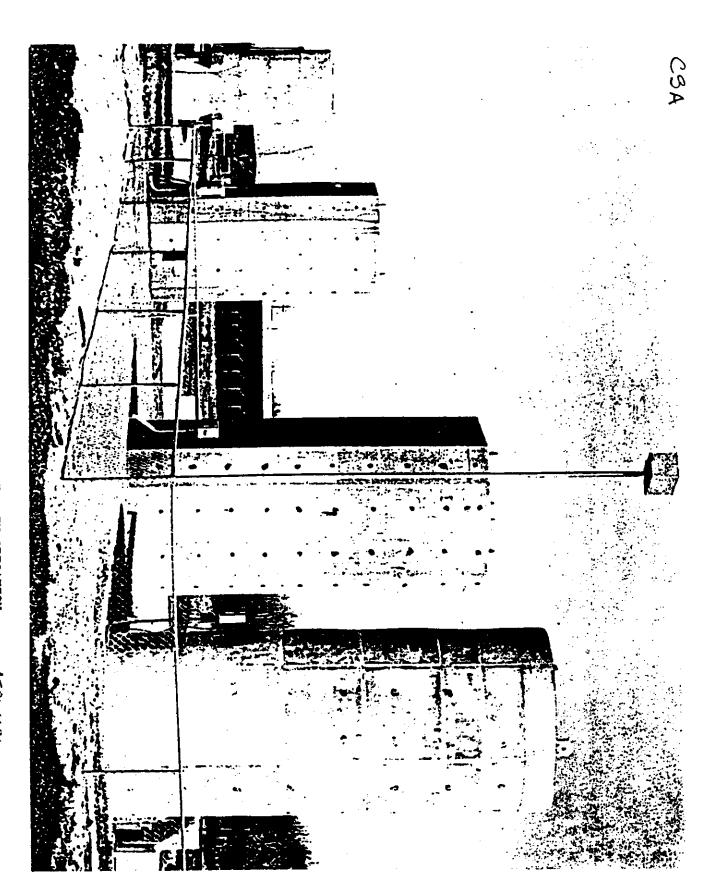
CYLINDRICAL CONCRETE CANISTER
